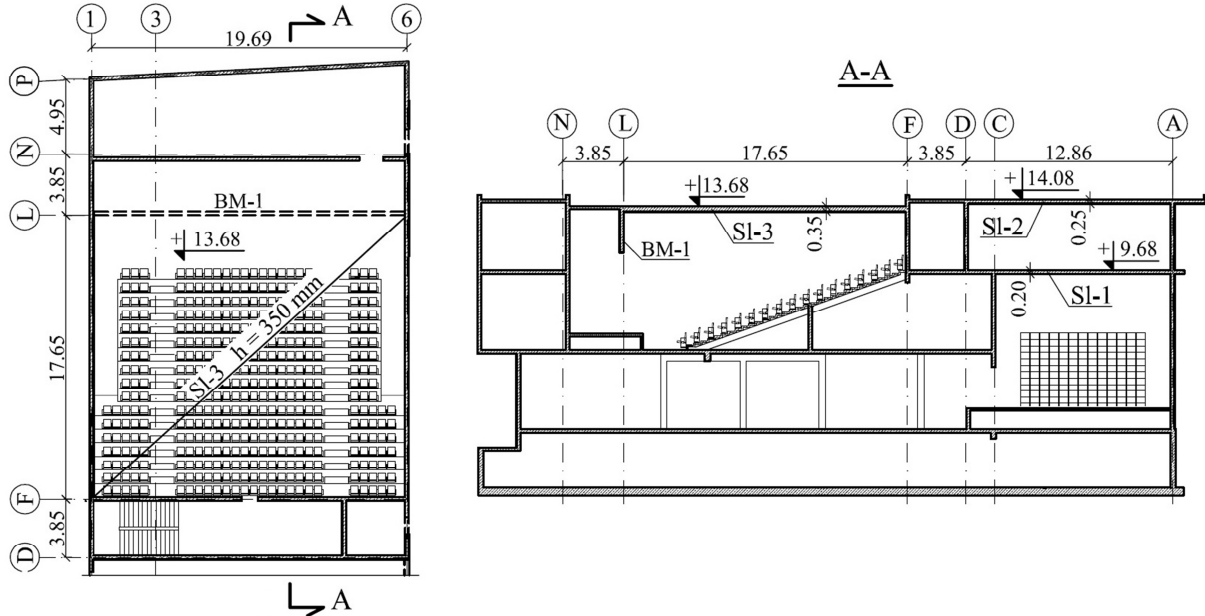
Segment plan and vertical section of the building with unique span post-tensioned slab SI-3.
